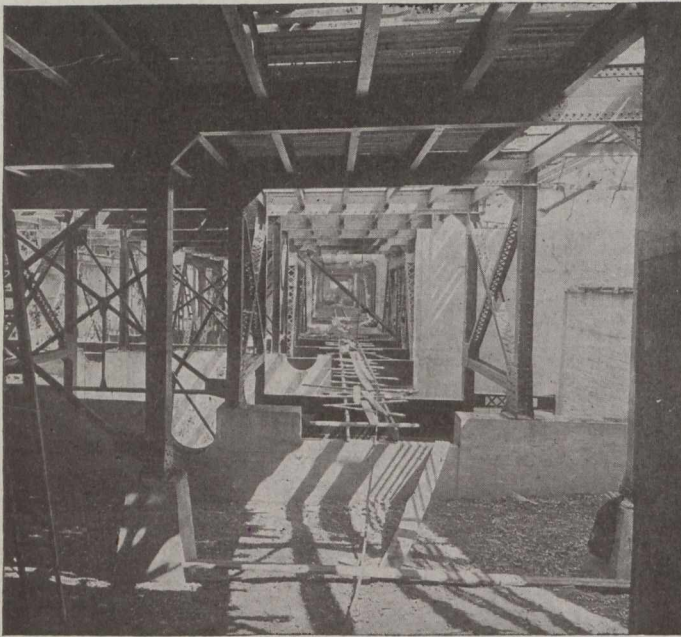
View Through One Side of Lower Deck, Rosedale Section, Looking East.
